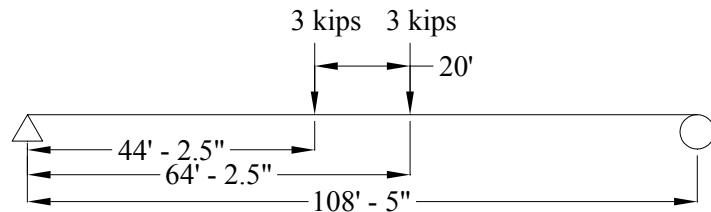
Location of Interior Diaphragms on a Simply Supported Bridge Girder.
